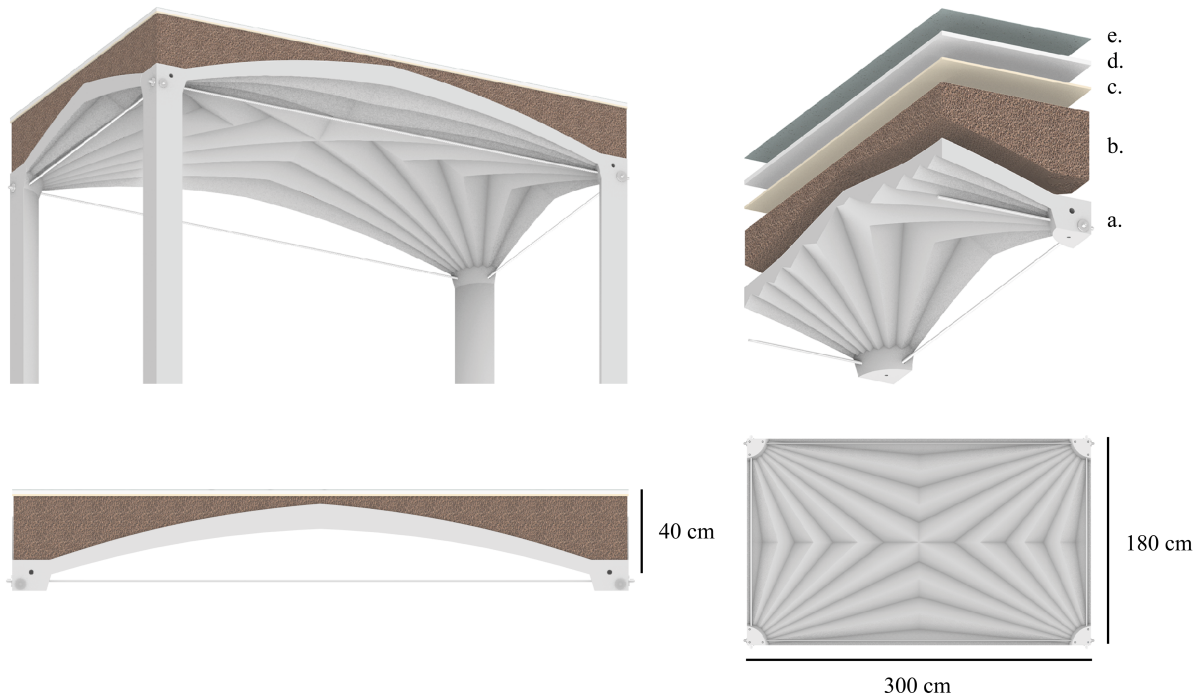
System design of the “Unfold Form” floor system with (a) fan-vaulted shell and floor build-up with (b) dry fill, (c) fibre boards, (d) dry-screed, and (e) rubber floor finish
